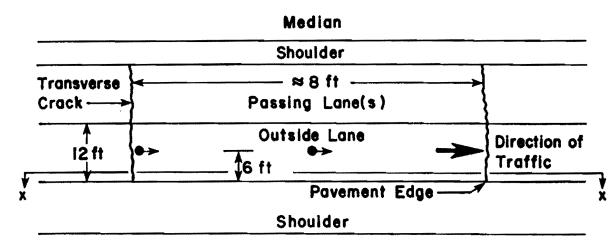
Recommended test locations for void detection on CRC pavement of a typical divided highway (Ref A3).
